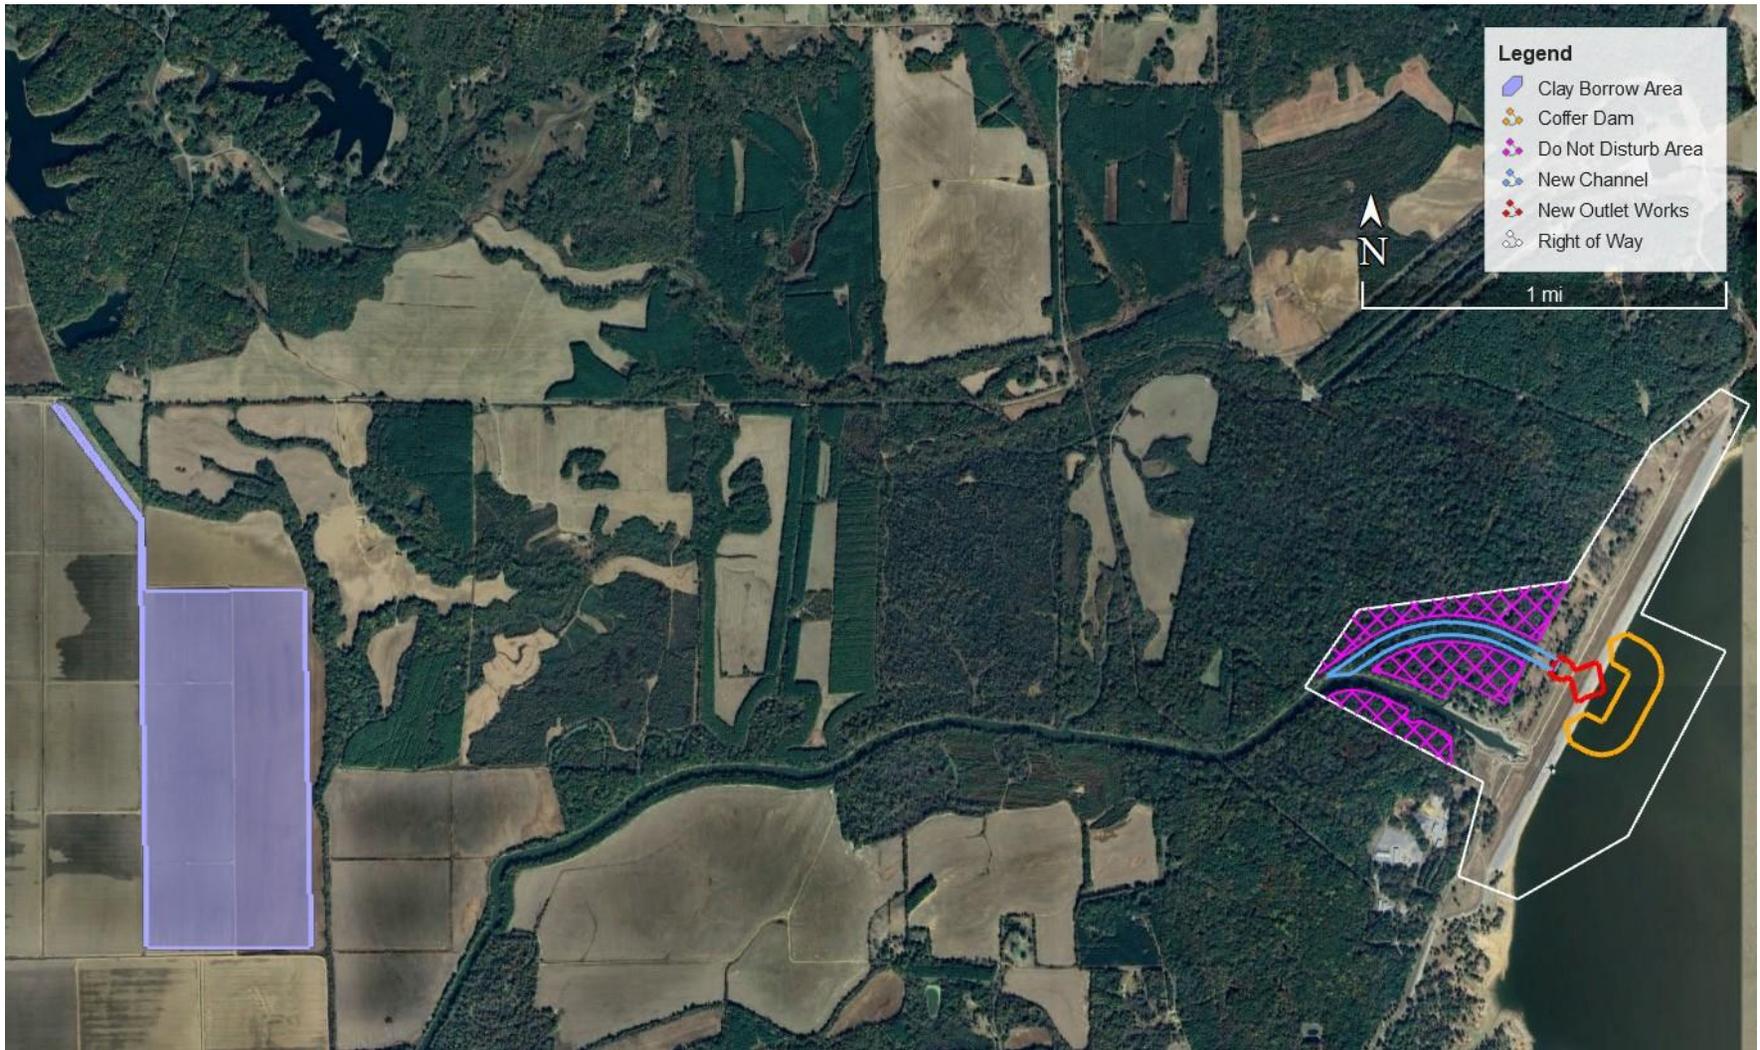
Project Site Plan, Arkabutla Dam, DeSoto County, Mississippi.
